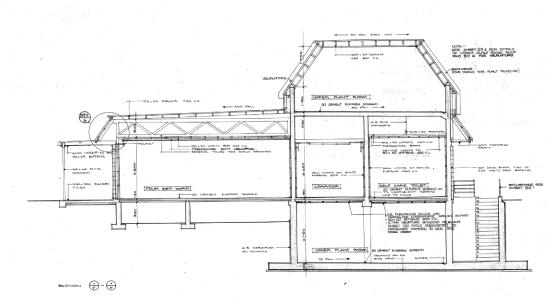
Spinal Injuries Unit – Plant Building Section
